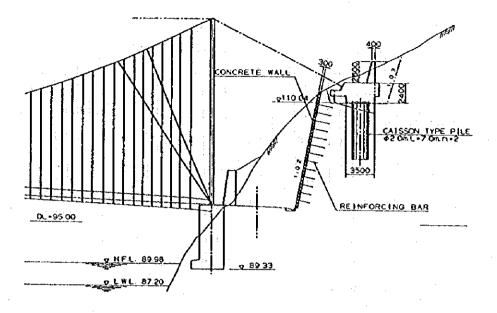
Reinforcement for Anchorage of Existing Suspension Bridge at Nepalthok by Cast-in-situ Concrete Deep Shaft
